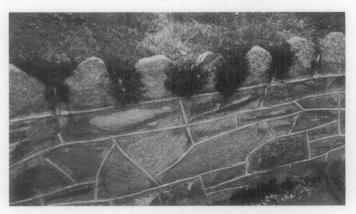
This stone garden wall was tuckpointed to match the tuckpointing on the c. 1920s house on the property. Photo: Anne Grimmer.
